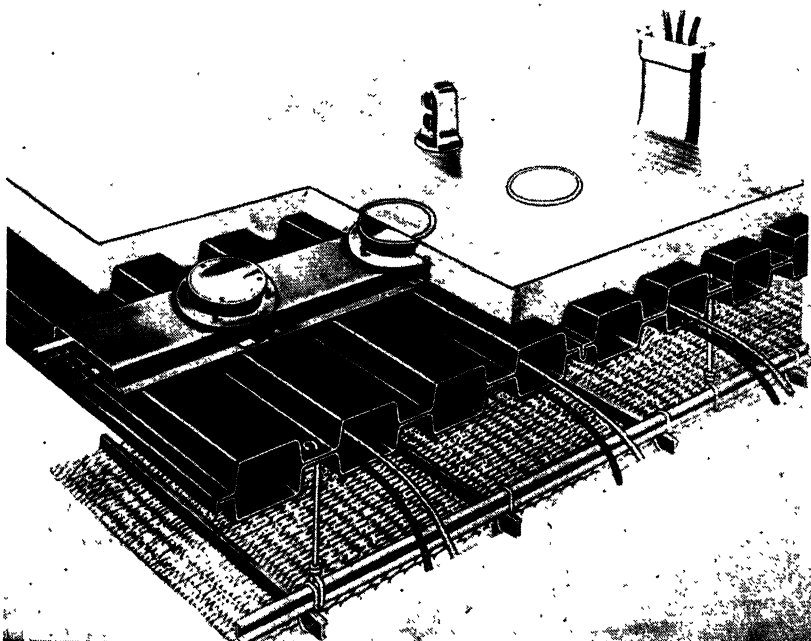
A Sectional Sketch of Cellular Steel Floors with Raceways.
